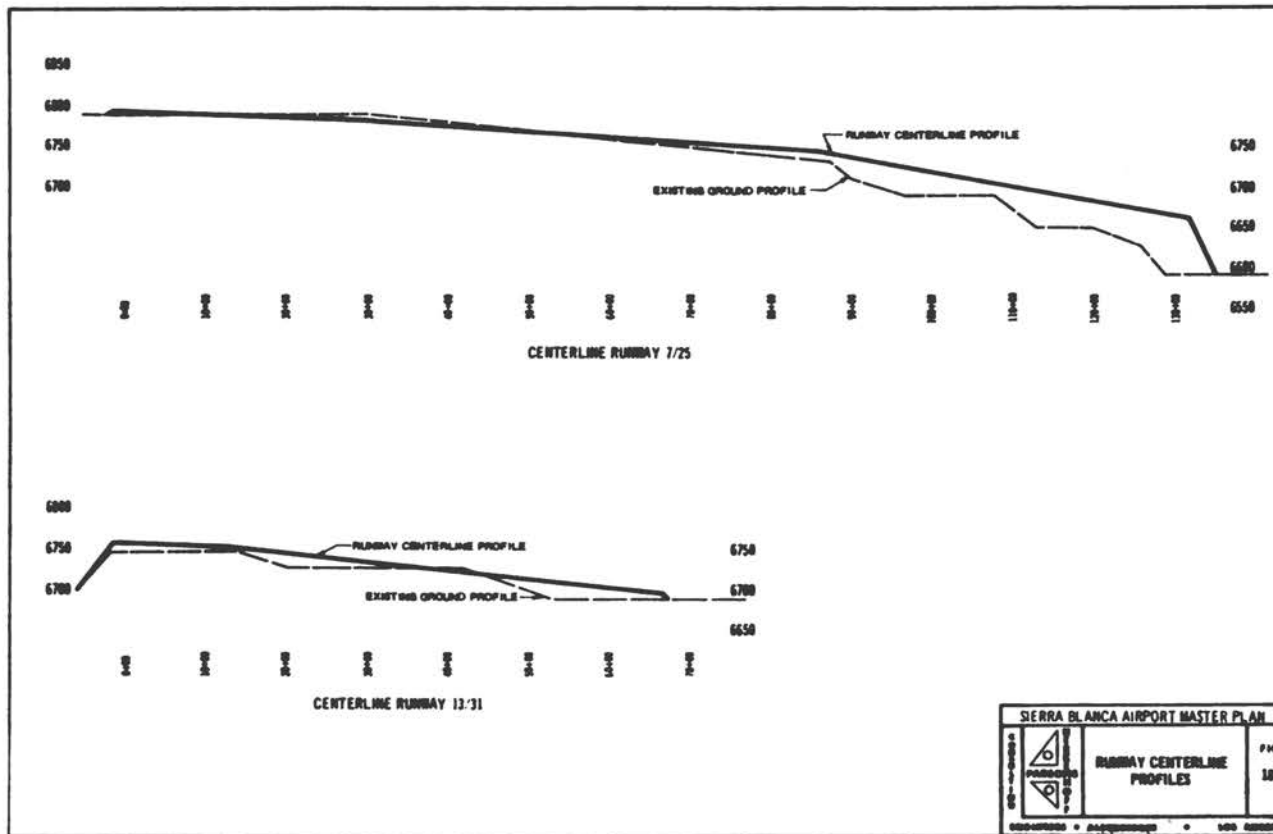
Runway center profiles in relation to the existing ground profile, indicating the amount of fill required to bring the runway up to the proper elevation.
